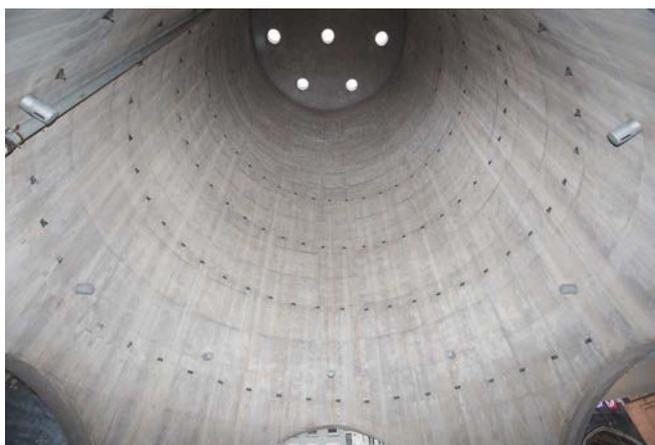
Exposed post-tensioned tendon anchor heads at central cylinder
